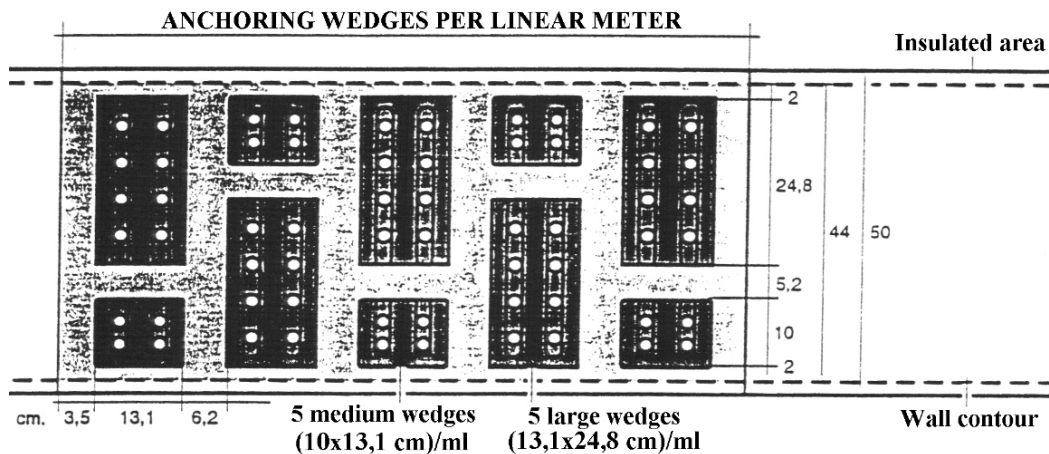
Right arrangement of anchoring wedges for a 44 cm wall thickness.
